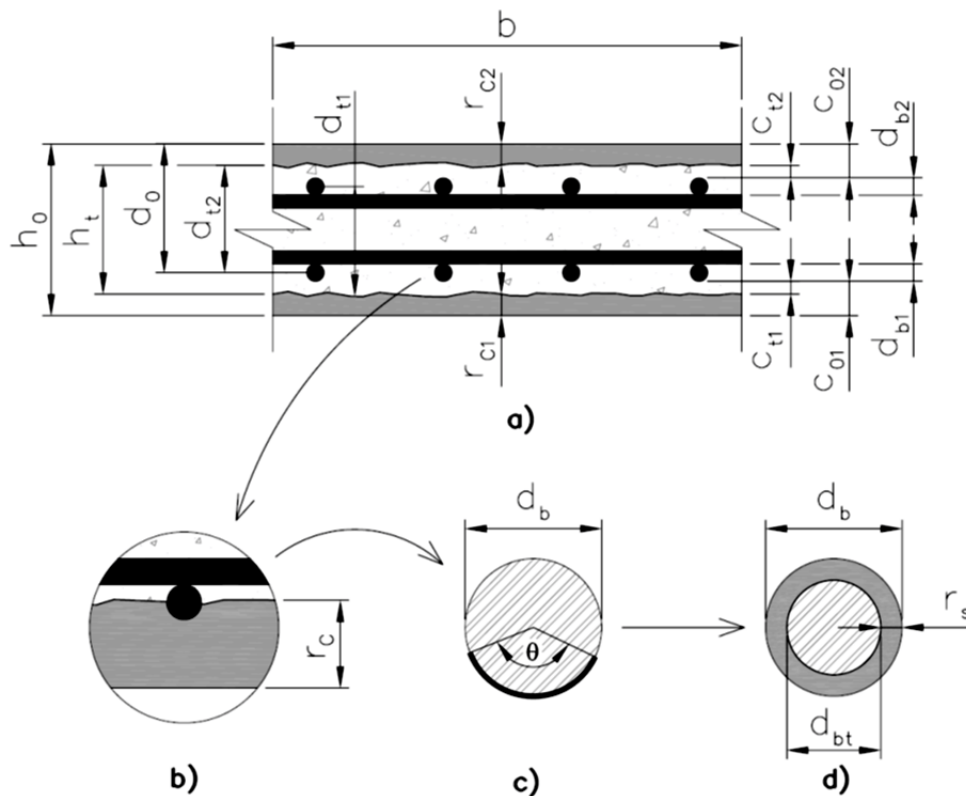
Reinforced concrete section parameters for the structural and durability design [3]
